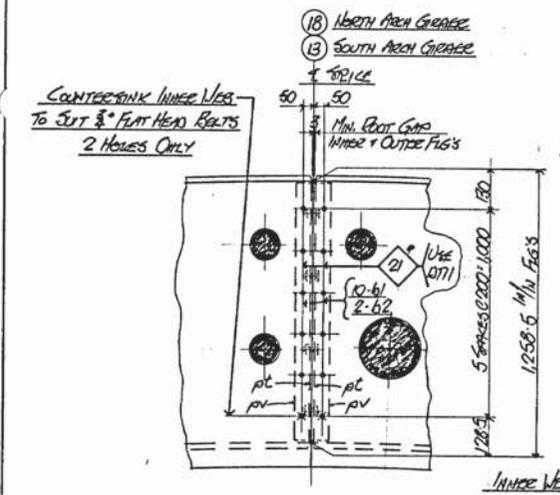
DETAIL 'B' (DOUBLE AMPHIRASH GIRDER)
